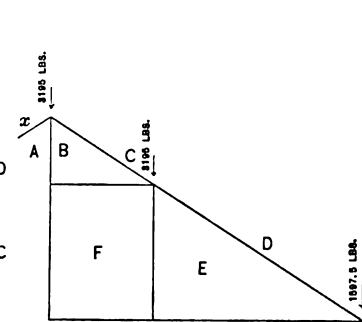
Skeleton of Queen Post Truss.—Scale, 3-32 Inch to the Inch.
